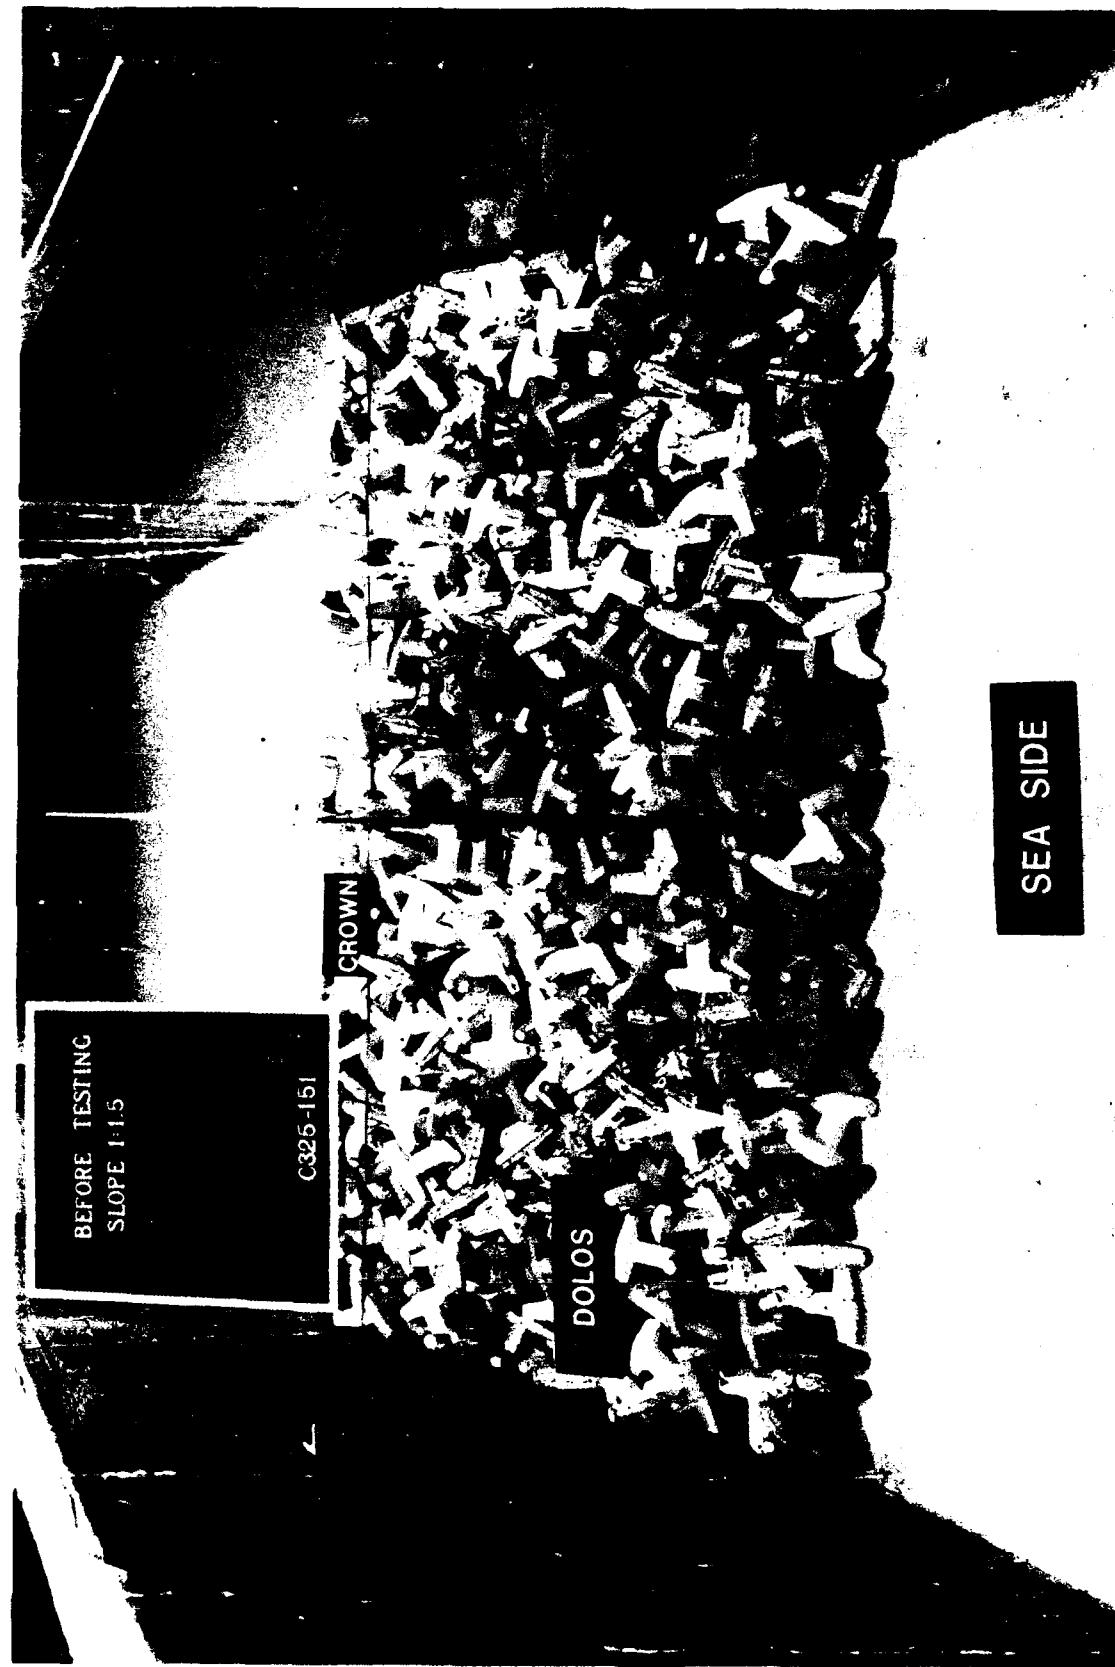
Sea-side view of a typical test section before wave attack at a 1V-on-1.5H-sea-side-structure slope; $W_a = 0.589$ lb
